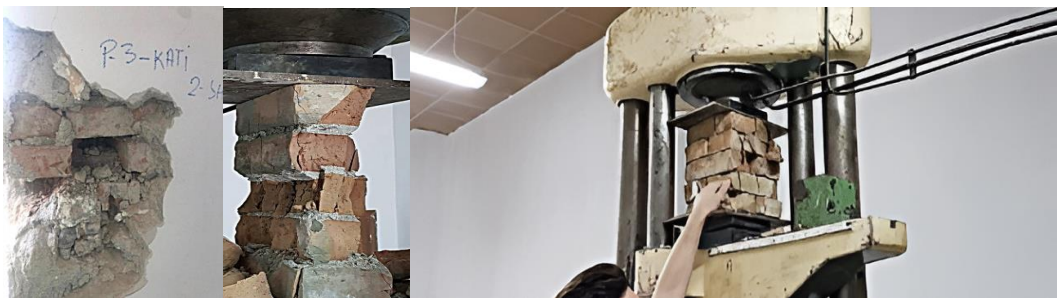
Samples taken from damaged buildings and masonry block testing
